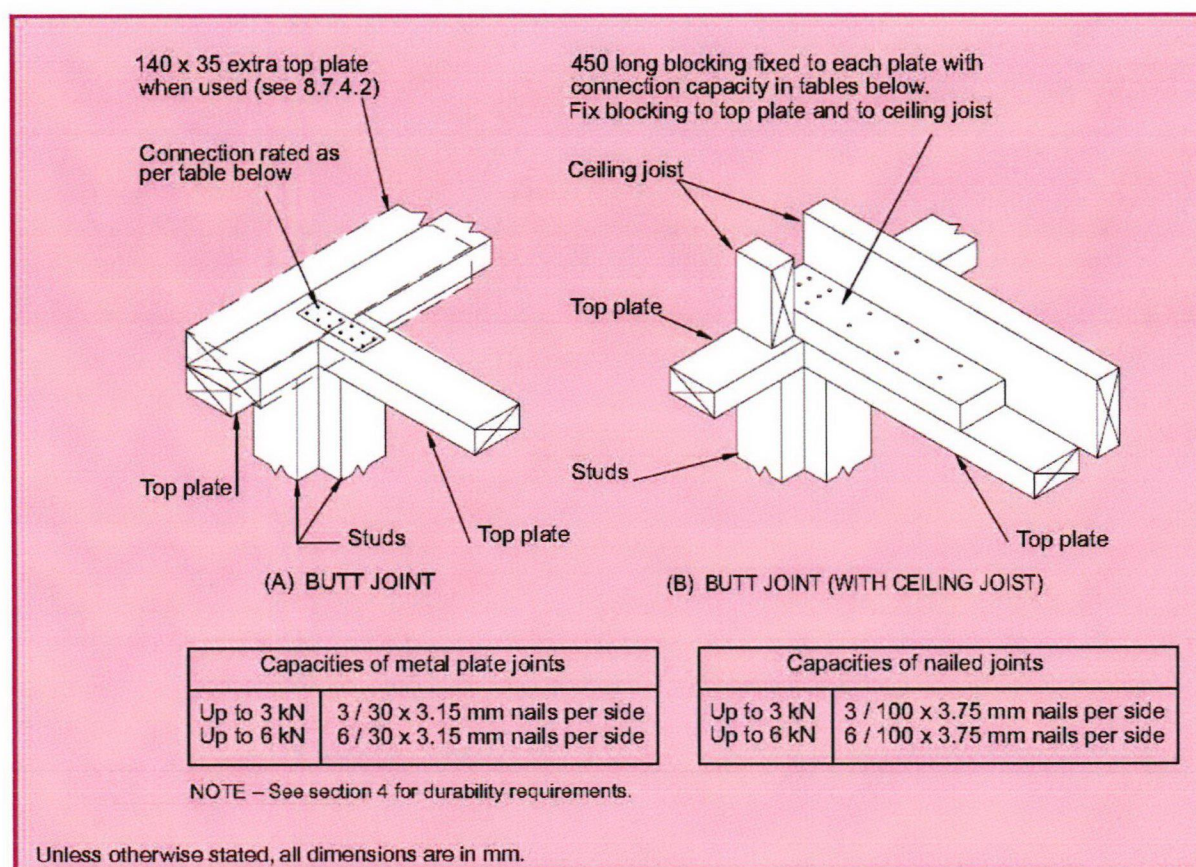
Connecting top plates to external walls at right angles - Walls containing bracing (see 8.7.3.4)
